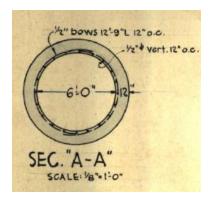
Circular shaped storm drain. Segment 2-TUN-6, constructed 1939-1940.
